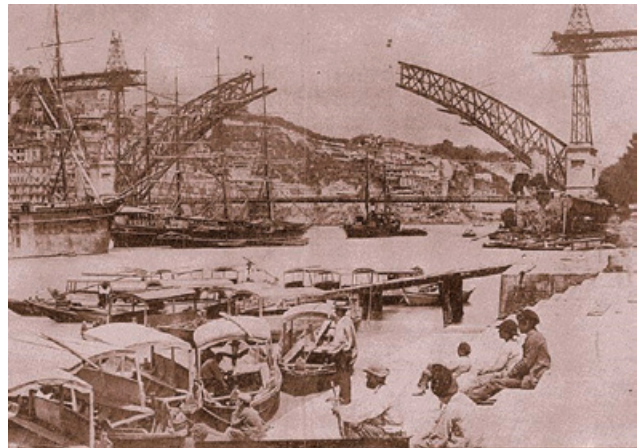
LUIZ I BRIDGE – arch under construction, with the suspension bridge in front by 19th Century photographs of unknown authors
